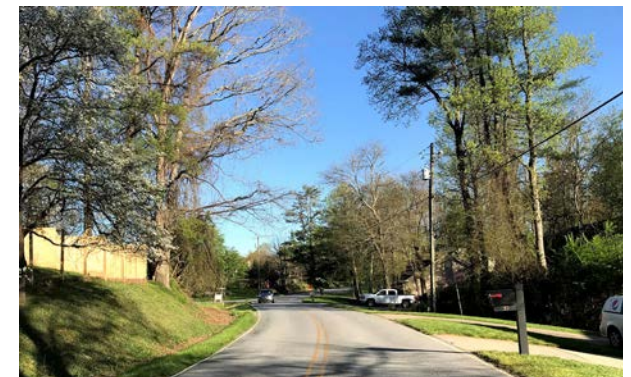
Example of Private Property Impacts that Would Need to be Considered on Fanning Bridge Rd (SR 1358)
